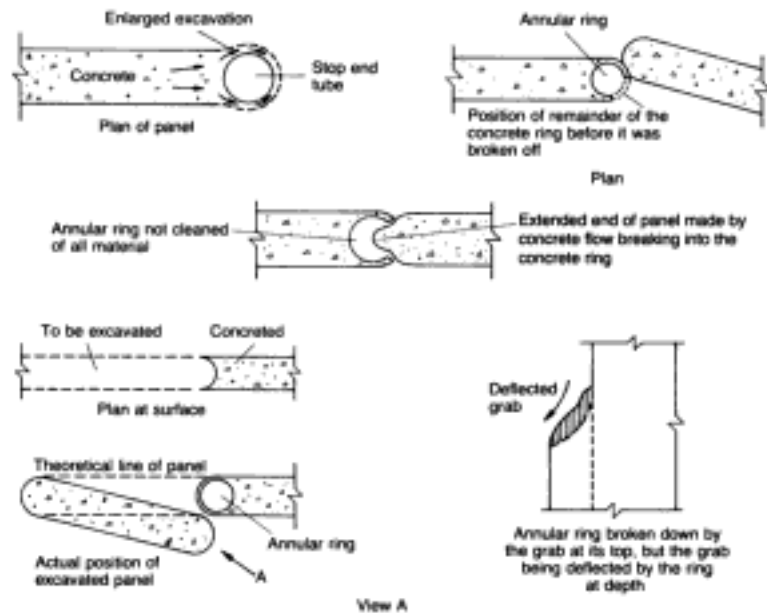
Risk of faulty diaphragm wall construction caused by an annular ring of concrete bypassing the stop-end: (a) cause of annular ring of concrete; (b) faulty construction (misalignment of adjacent panels); (c) faulty construction causing vertical inclusion at panel joint; and (d) faulty construction (misaligned panel at joint below ground)
